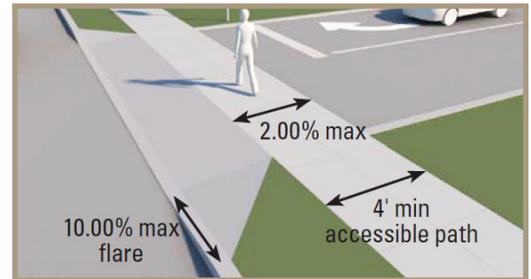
One way to design ADA-compliant driveway ramps. (Photo Credits: NJDOT Complete Streets Design Guide)
